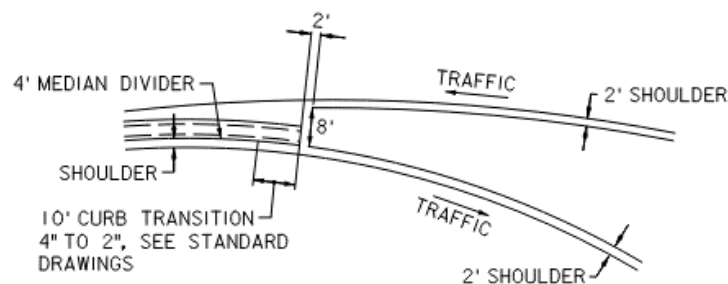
Interchange Ramp Curb Sections and Details
